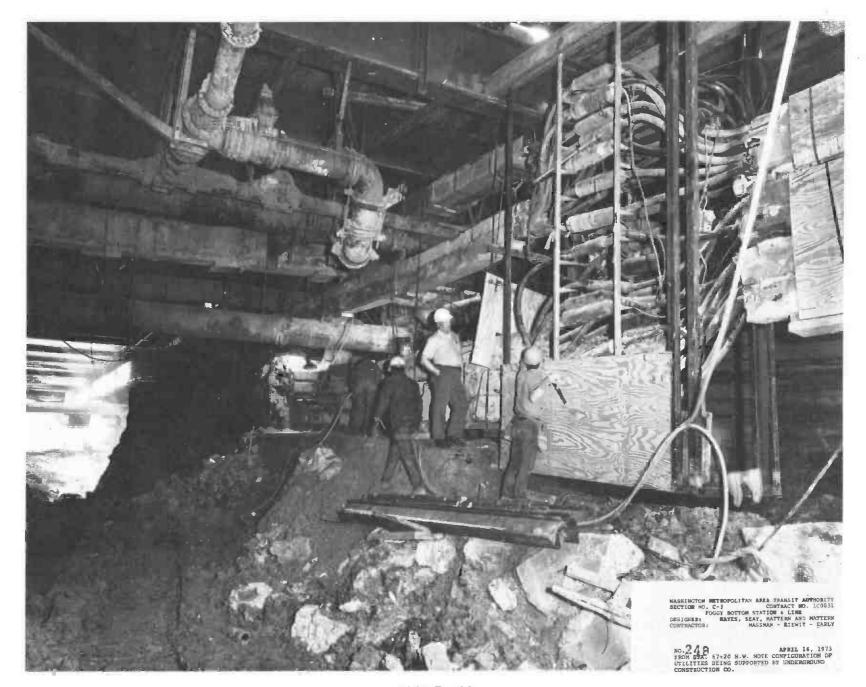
TEMPORARY STEEL AND PLYWOOD CAGE SUPPORTS A MANHOLE IN POOR CONDITIONS
